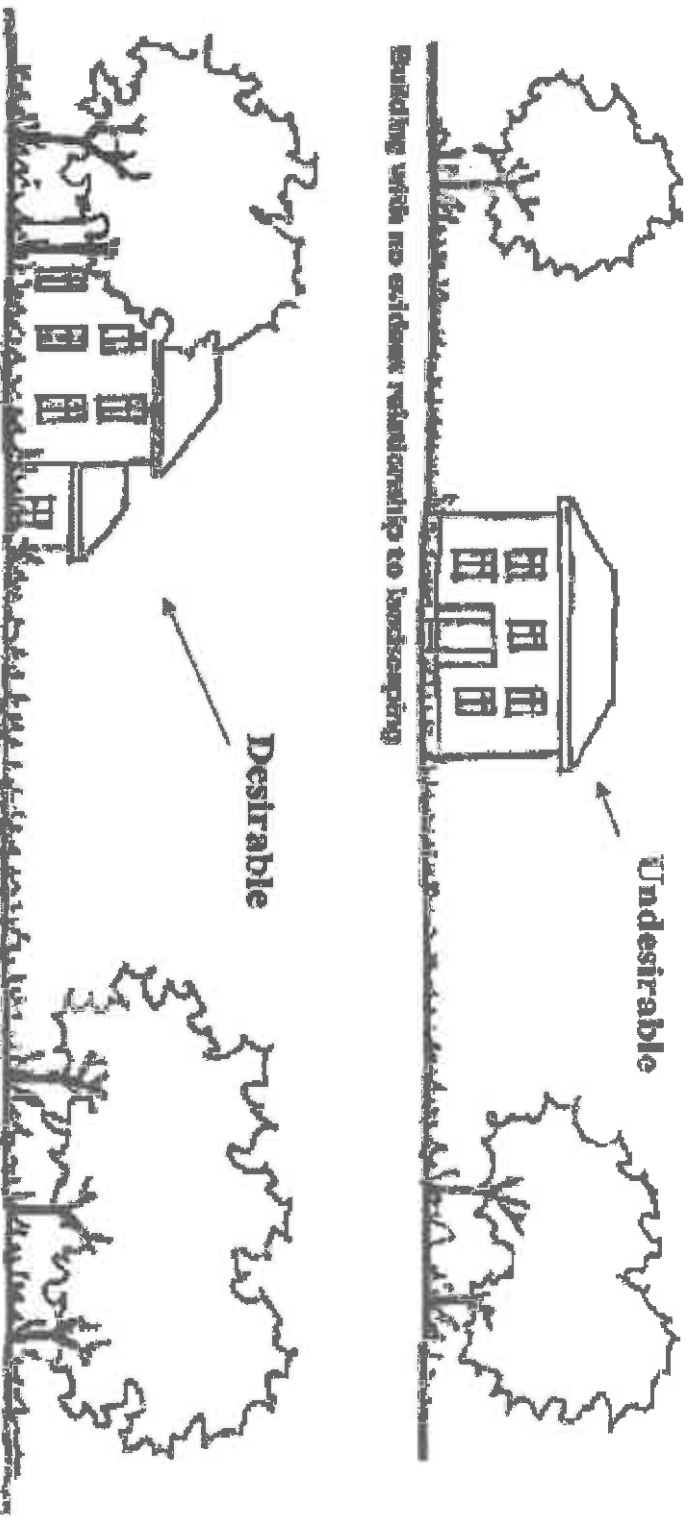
The landscaping at the top does little to mitigate for the bulk of the home. The landscaping at the bottom is sited in conjunction with the building, which gives a more natural appearance, mitigates for second story bulk, and provides shade for the home.
